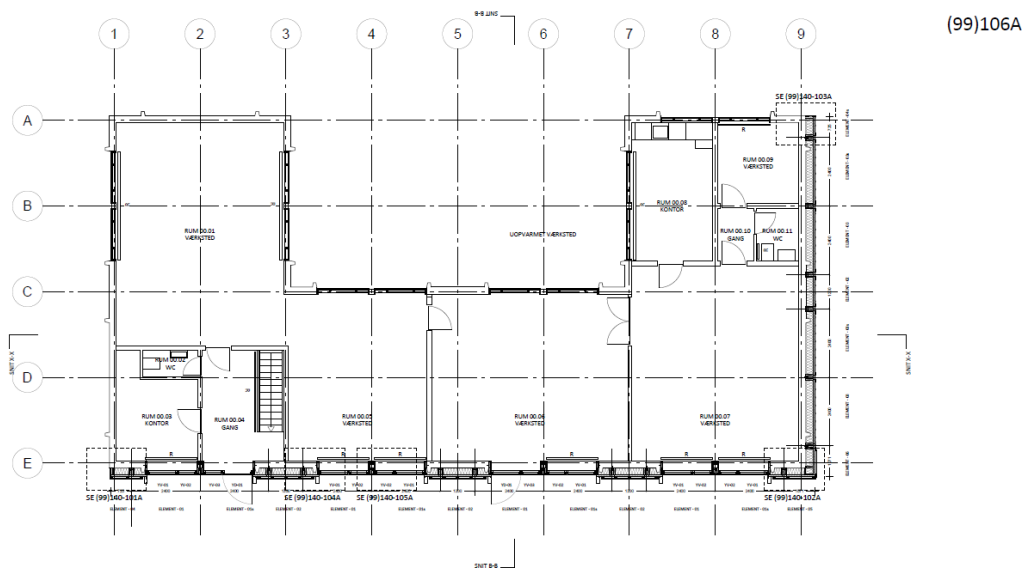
Floor plans [Ole Kjærulffs Tegnestue, 2013]
